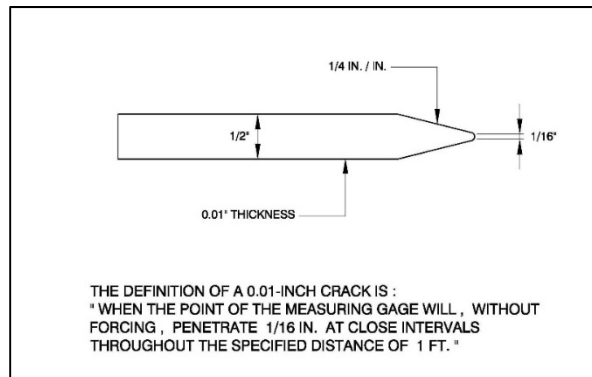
Illustration of the Gage Leaf used to measure D-Load crack in a three-edge bearing test.
